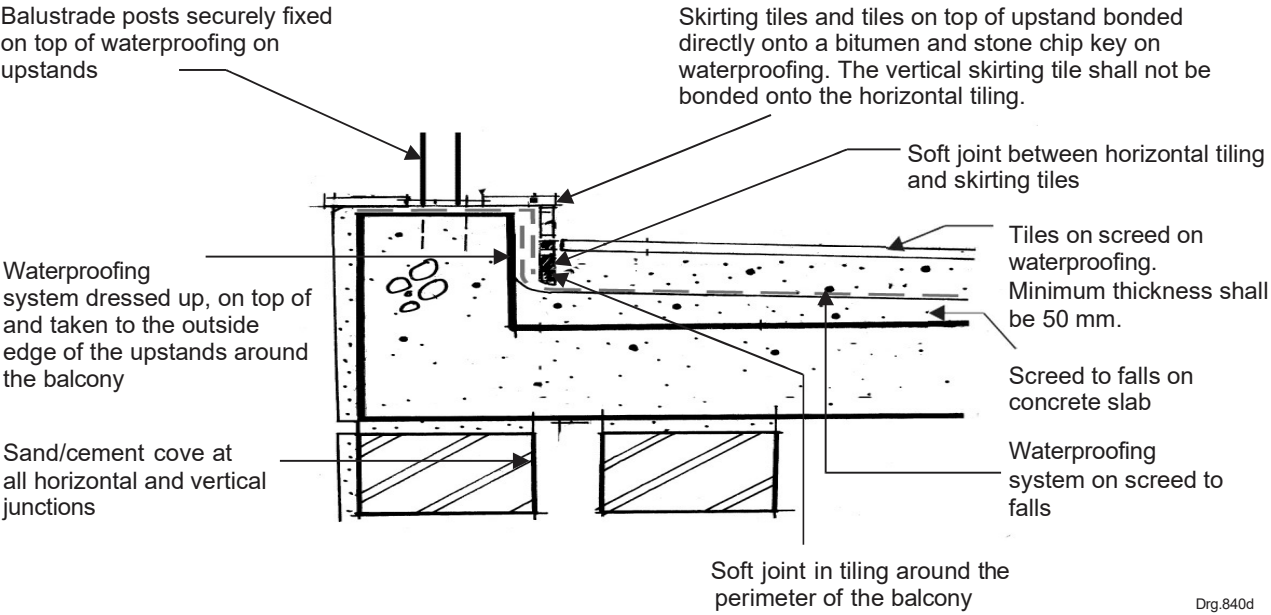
Waterproofing detail at perimeter upstand around a balcony
